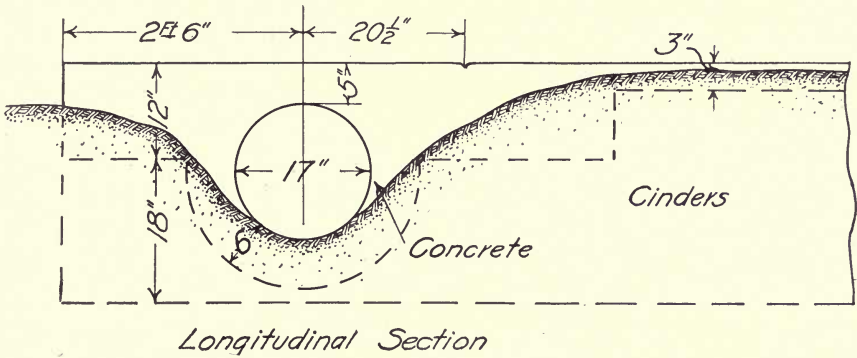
CONCRETE CROSS-WALK OVER GUTTER.
